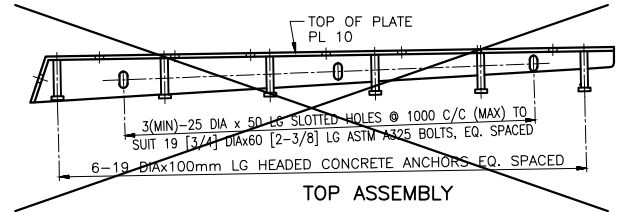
DETAILS OF HEADED CONCRETE ANCHORS AND INJECTION HOSE FOR ARMOURING AND NOSING ANGLES
